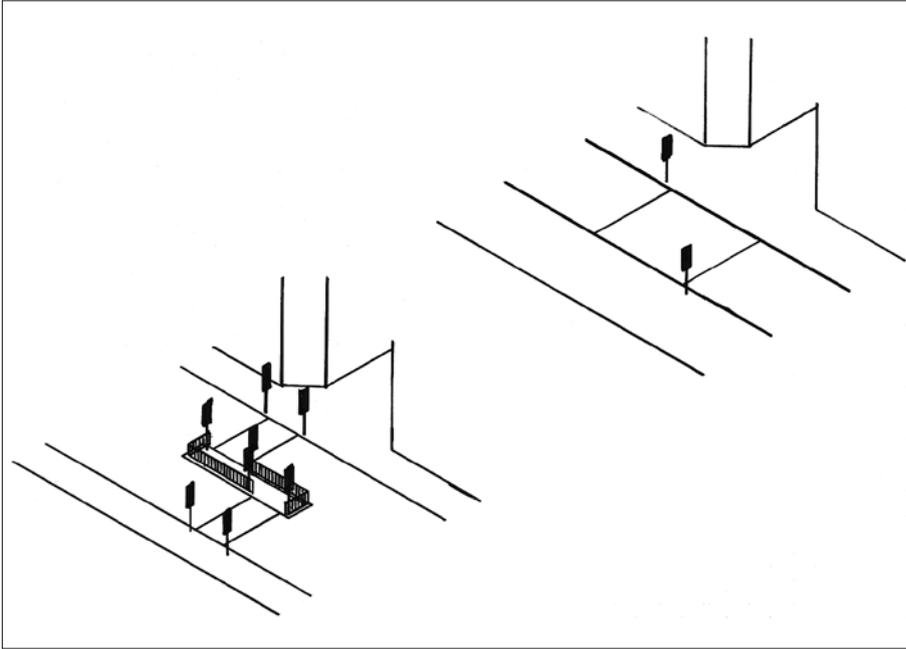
A hand-drawn 3D sketch illustrating scheme benefits – in this example, widening footways and replacing the staggered crossing with a one-stage pedestrian crossing.
